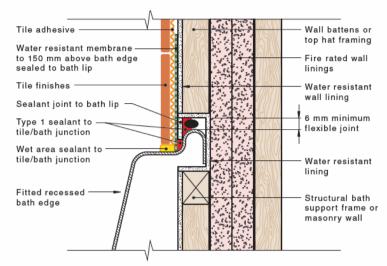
(E) — Bath with no shower over it — Fitted bath — Fire rated framed wall
